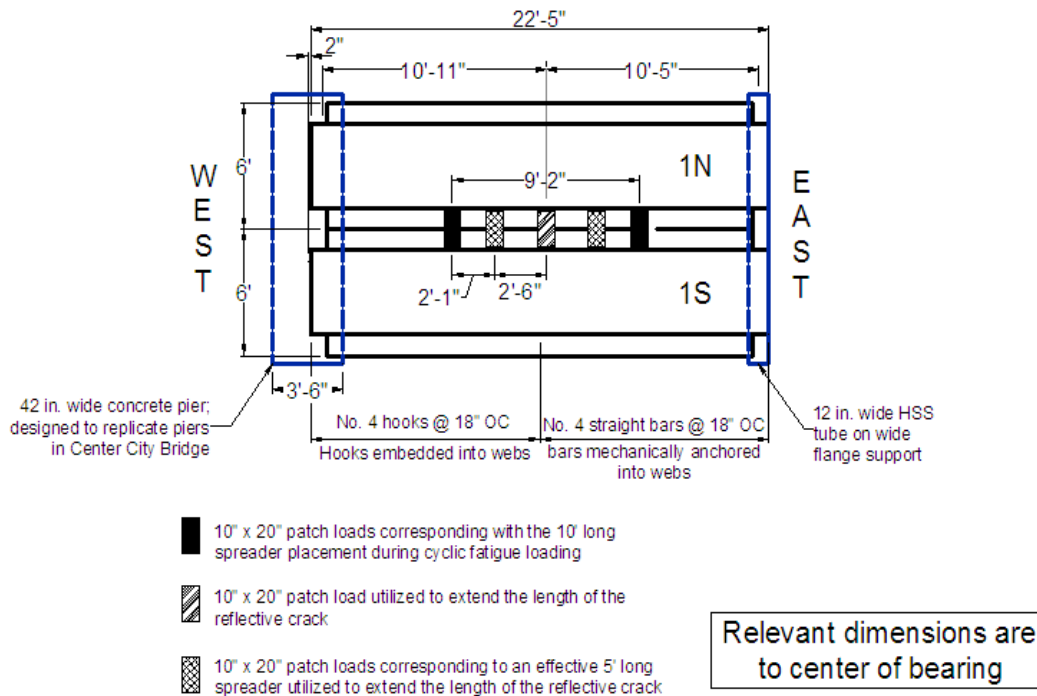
Placement of patch loads during fatigue loading and extension of longitudinal reflective cracking for the Concept 2 laboratory bridge specimen
